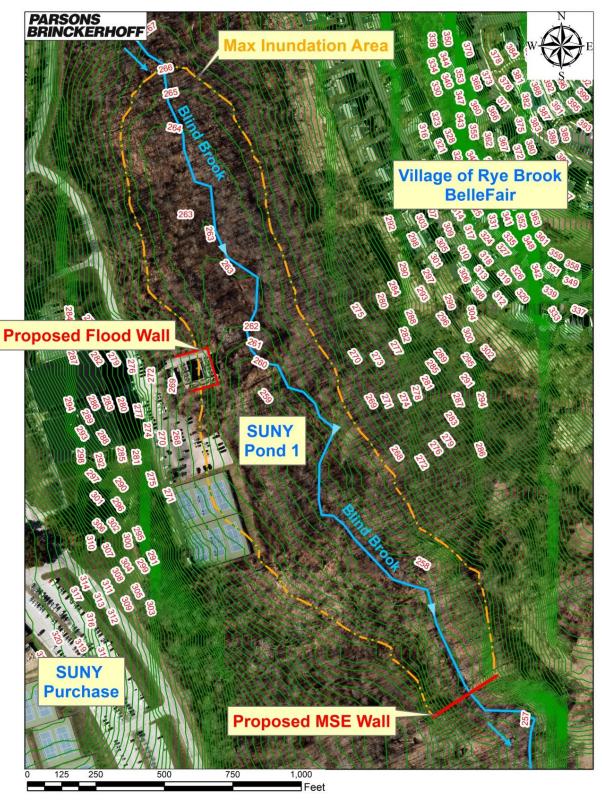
Proposed Detention Pond 1 (Upstream) in SUNY-Purchase
